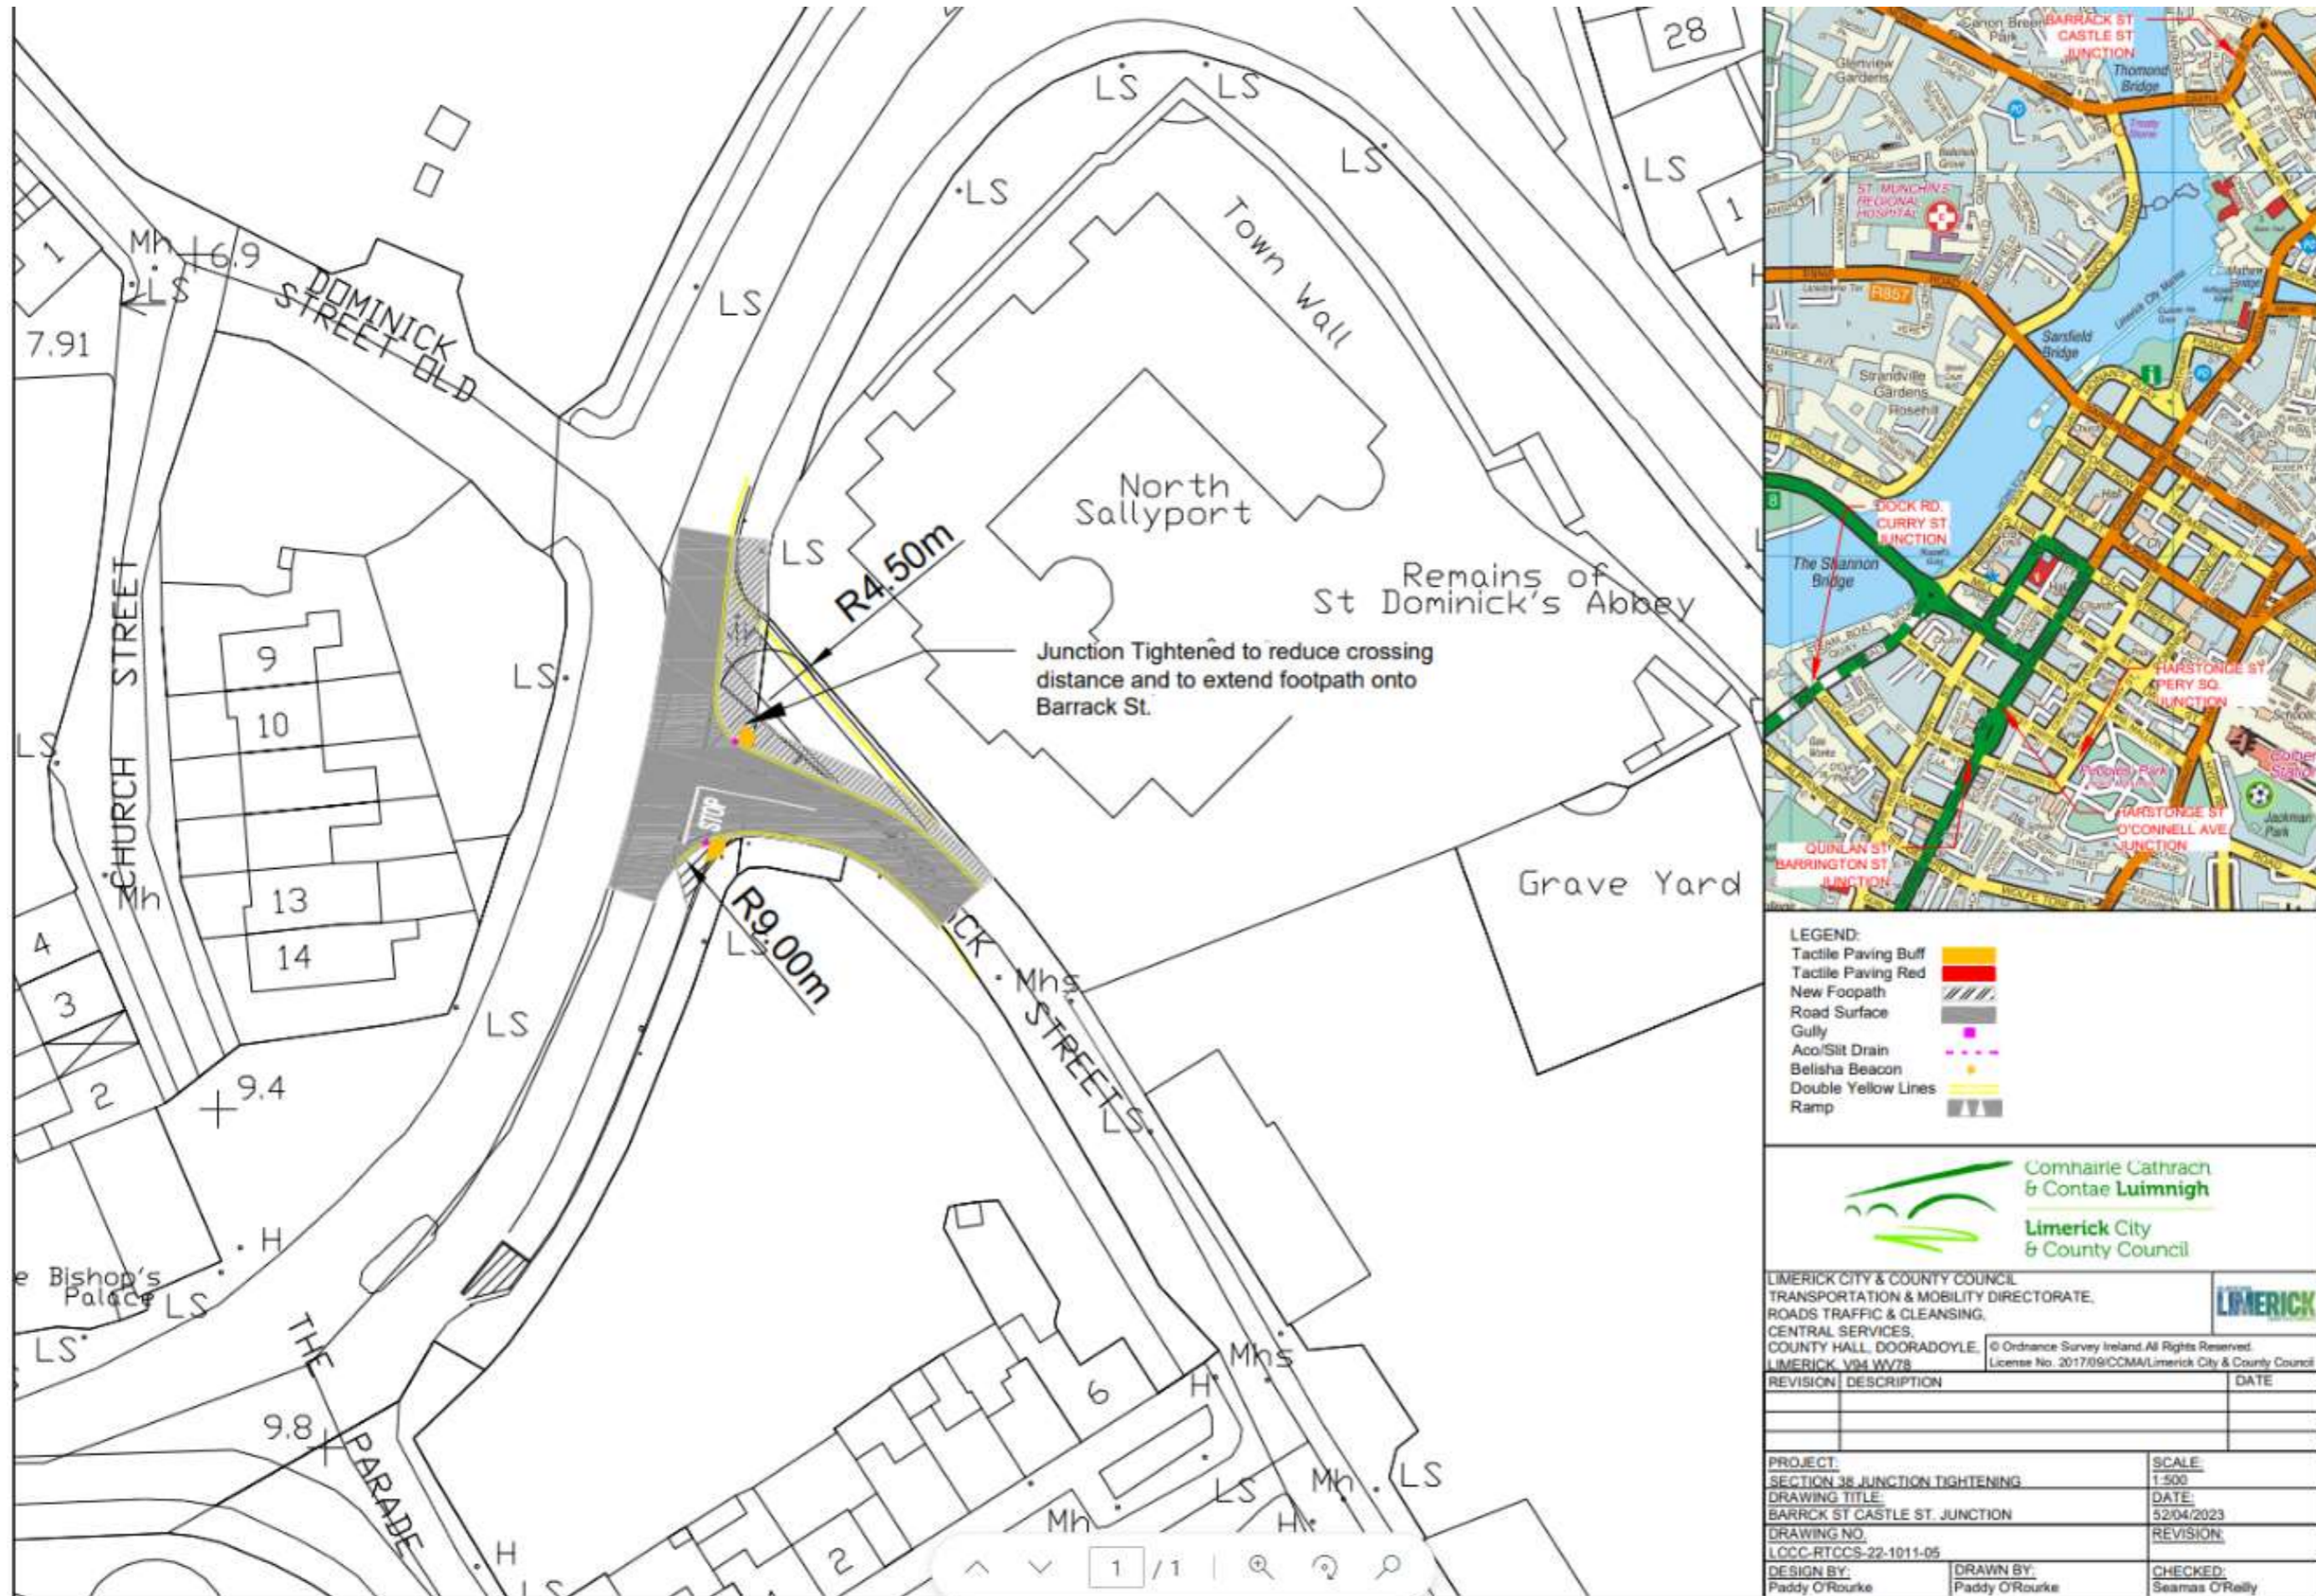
Barrack Street / Castle Street Junction Tightening
